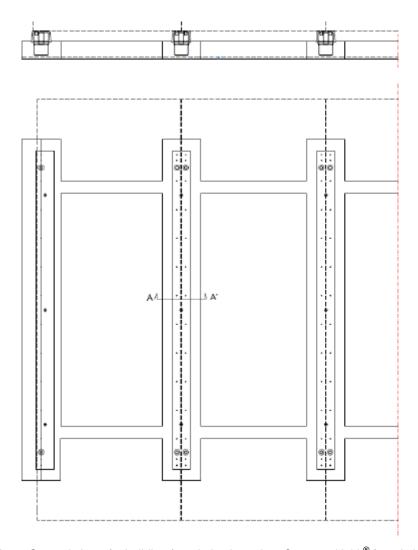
General view of a building foundation based on Compact Habit® foundation beams.
